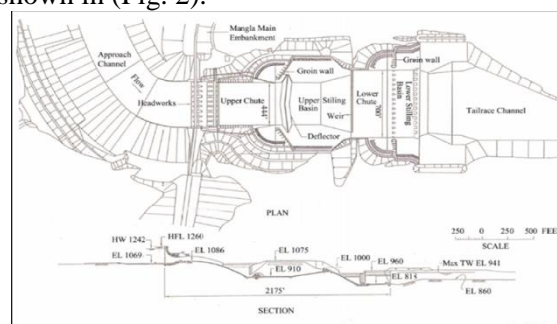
Plan and Longitudinal section of Mangla Dam Spillway
